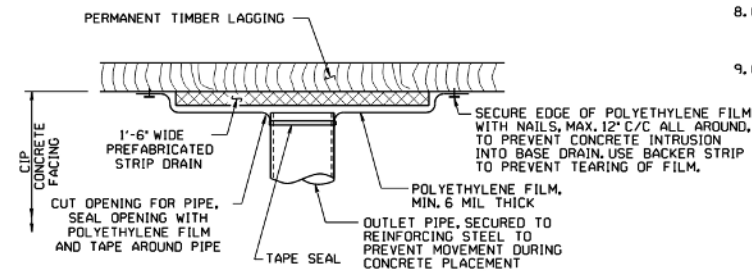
Typical Detail, Anchored Walls (Sheet 1 of 9)
